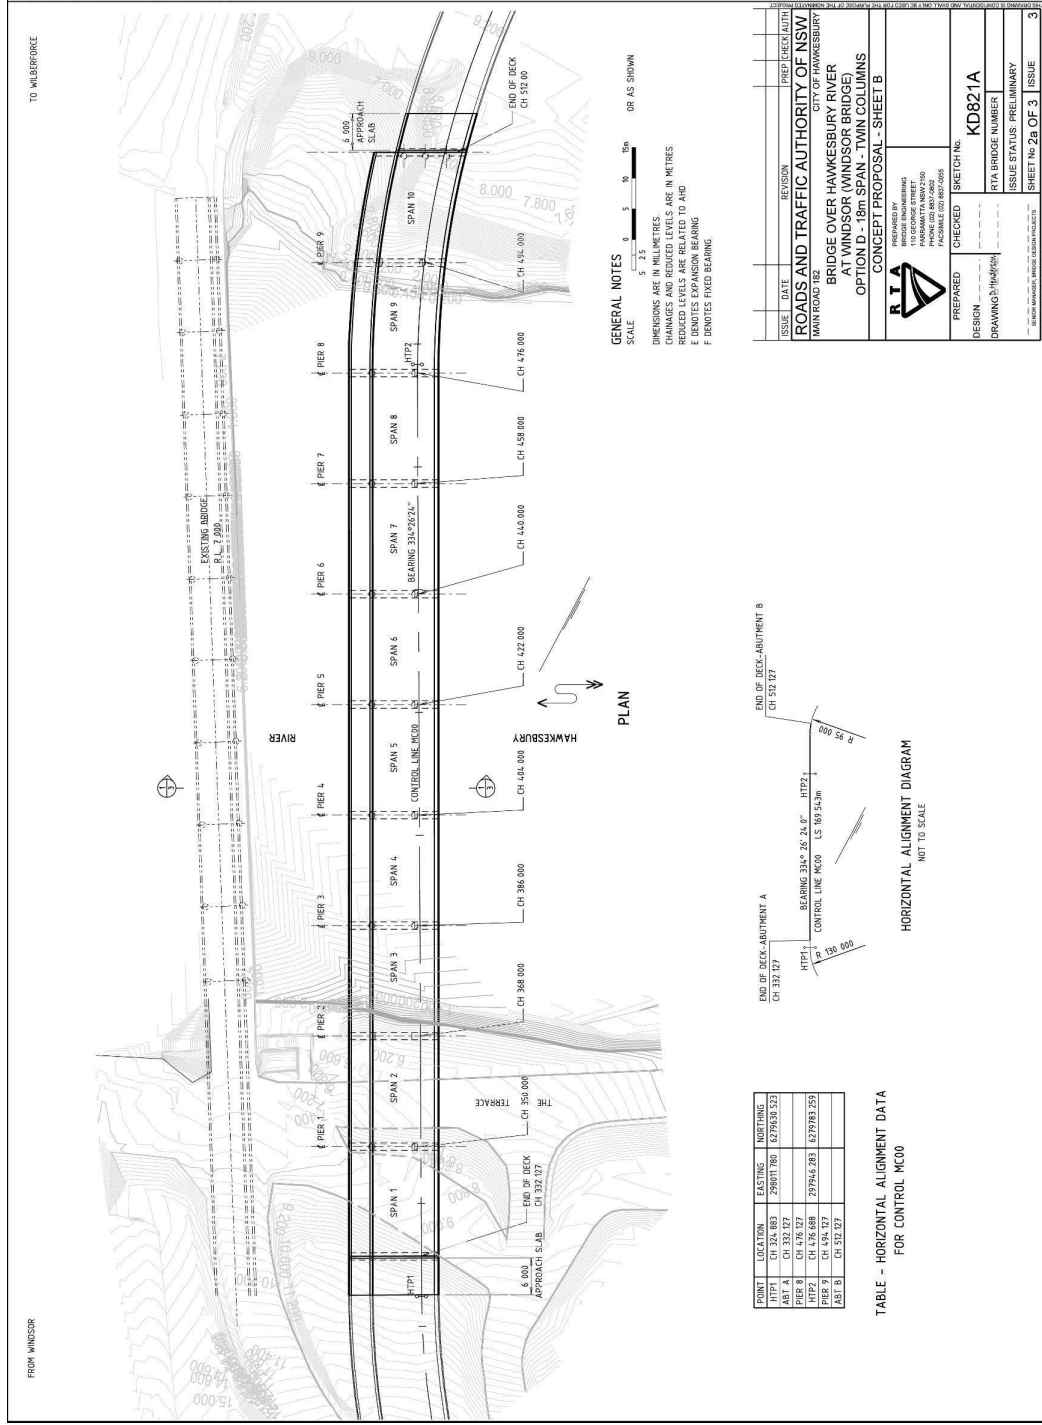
Proposed bridge replacement location and layout (RTA 2008).
